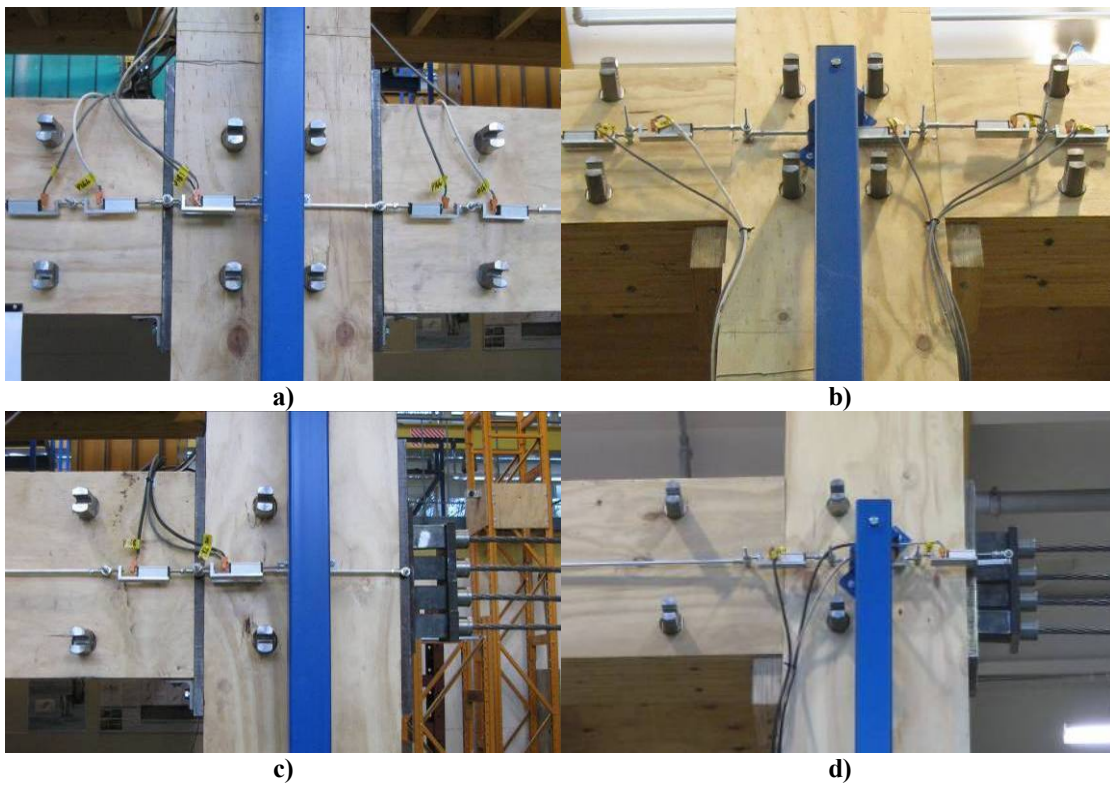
Frame connections at 1.5% Drift a) S column L2 b) S column L3 c) SE column L2 d) SE column L3
